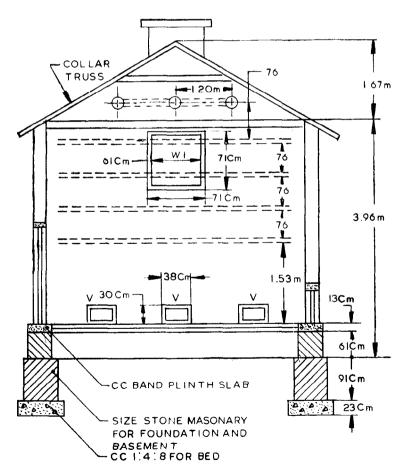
Cross Section with Structural Details (Karnataka Barn)
